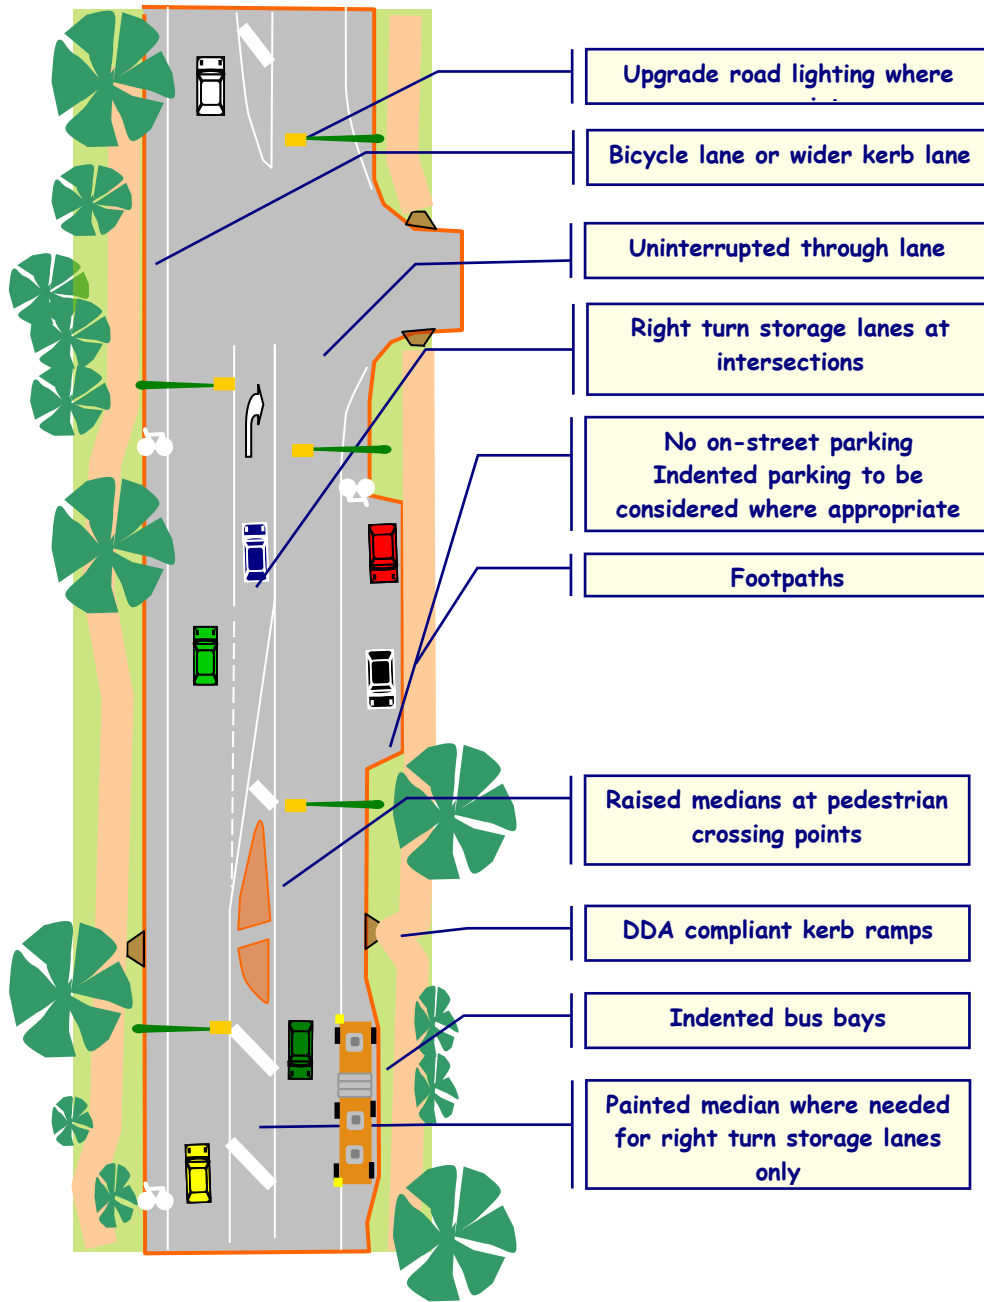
Typical Cross section of Golden Grove Road at side road junctions
